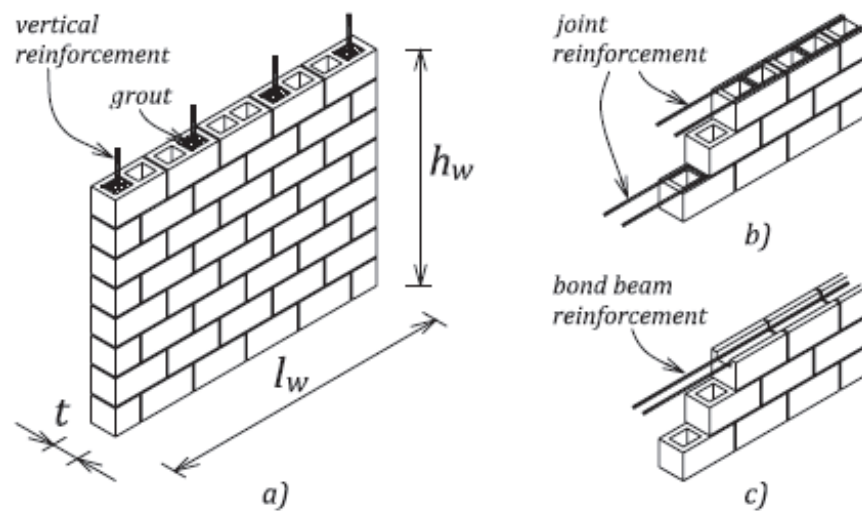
Typical reinforced concrete masonry block wall: a) vertical reinforcement; b) joint; c) bond beam reinforcement (Anderson and Brzev, 2009)
